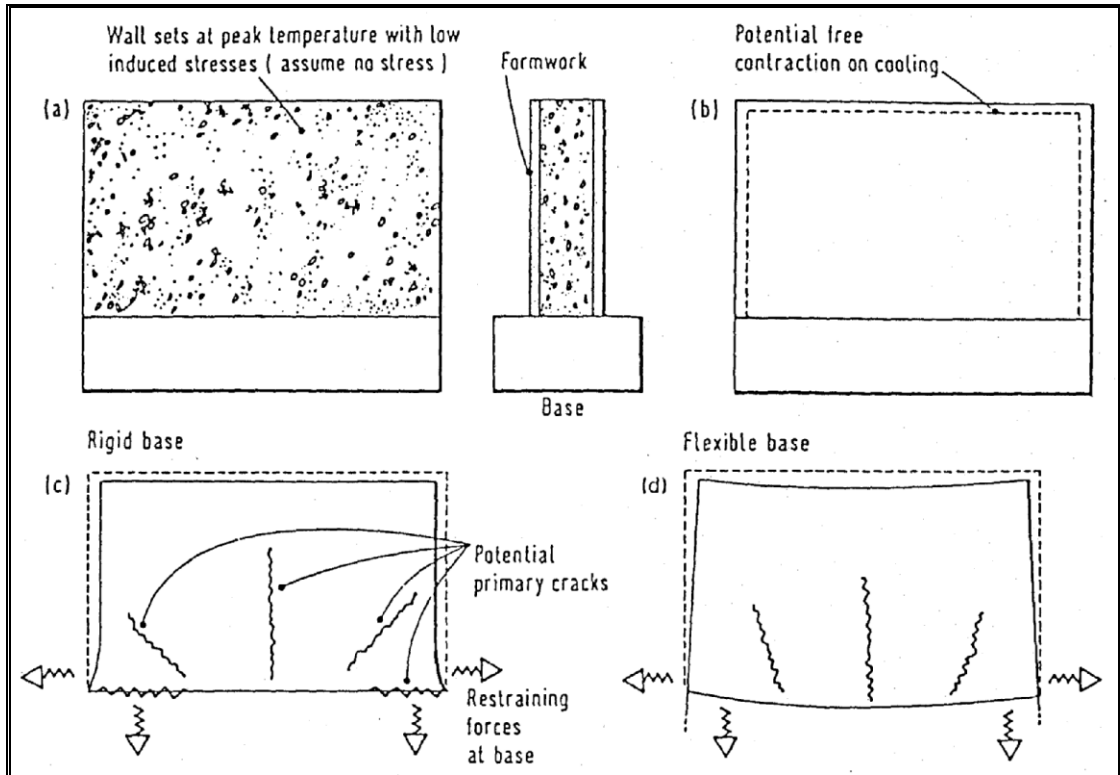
continuous edge restraint of the wall cast on base, (Harrison, 1981)
